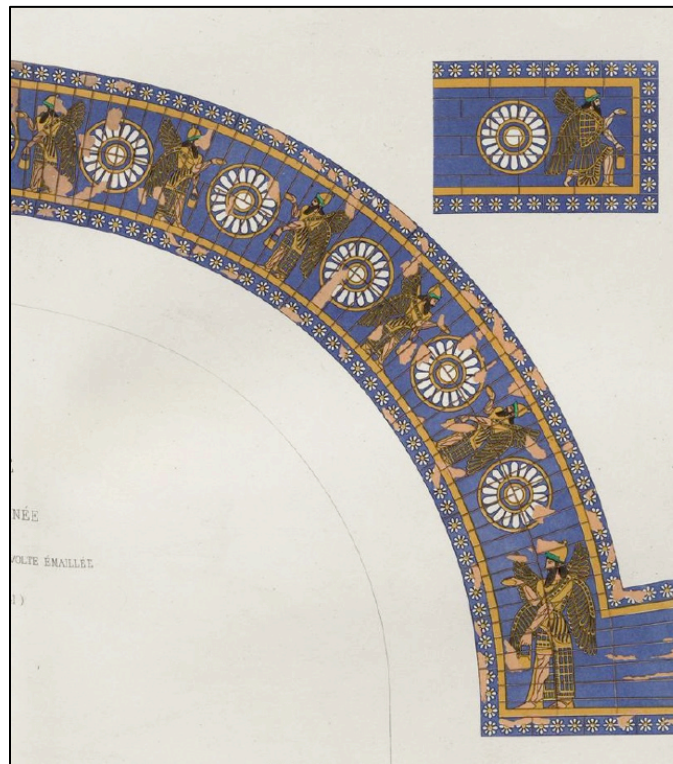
Drawing of the glazed brick-work from the city gateway, FIGURE 113. Place 1867–1870: pl. 14 (right half).
